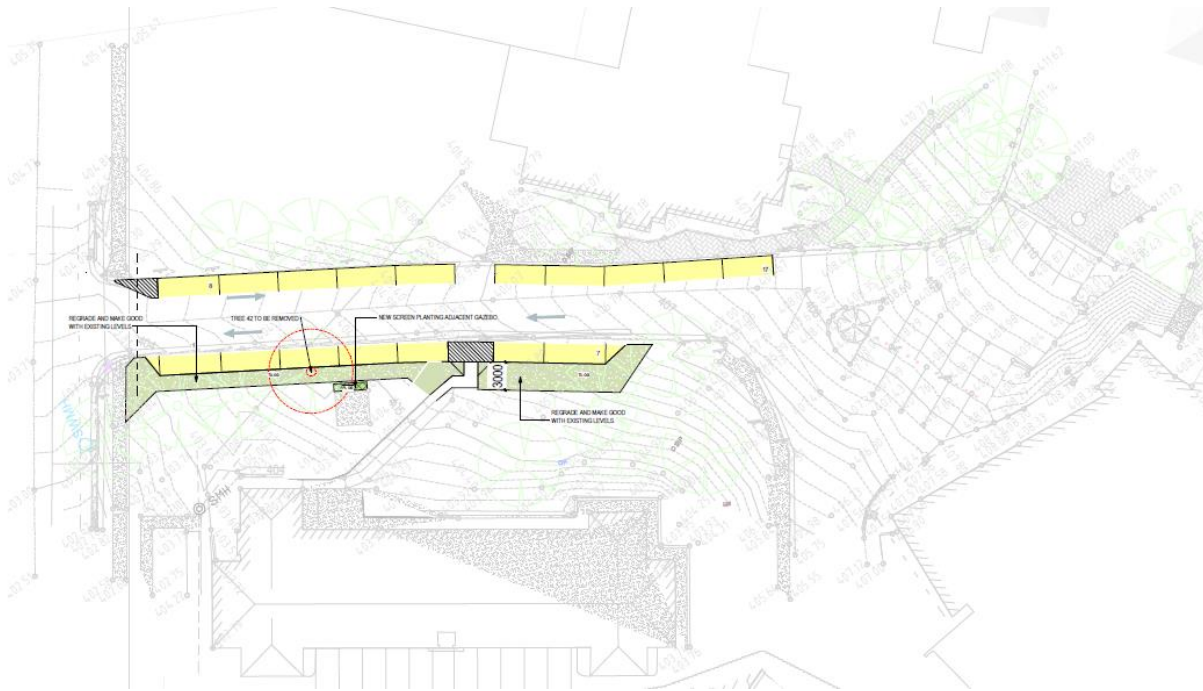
Carpark Plan South West Carpark A Zone 3.
